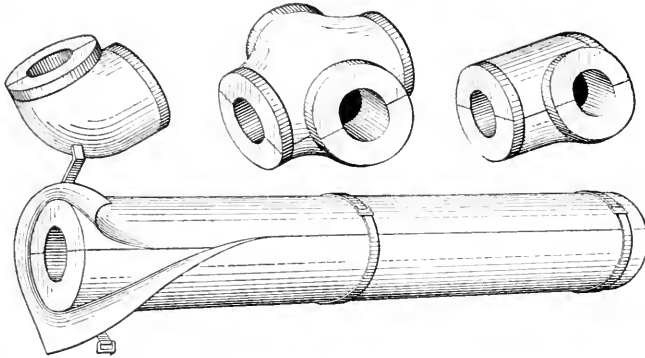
MOULDED 85% MAGNESIA COVERING FOR PIPE AND FITTINGS.
